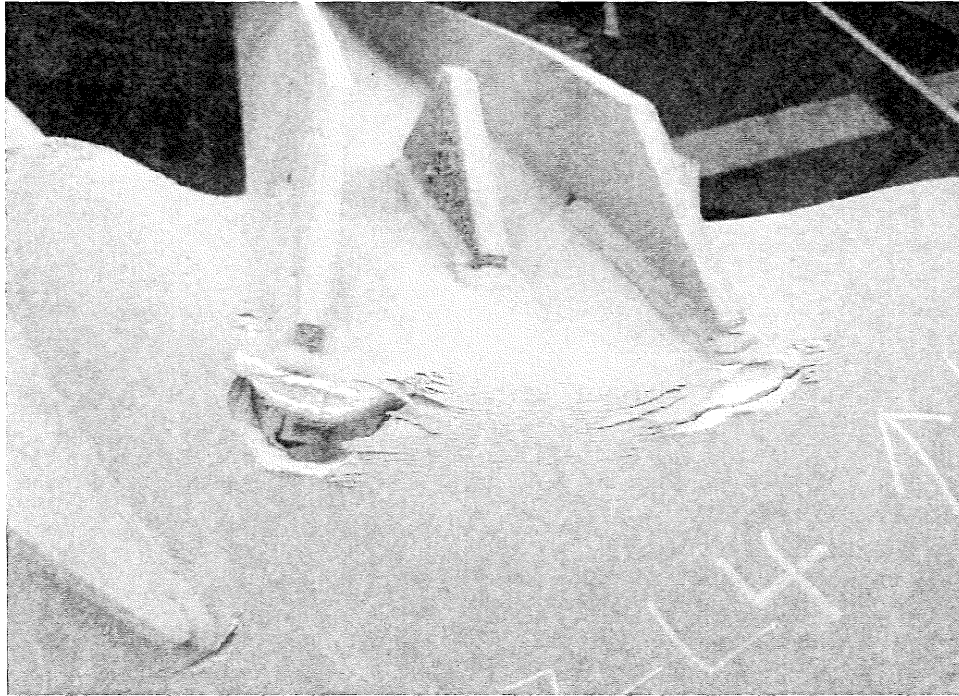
Tearing in gusset plate at flange tips of floor truss diagonals (FT7L4).
